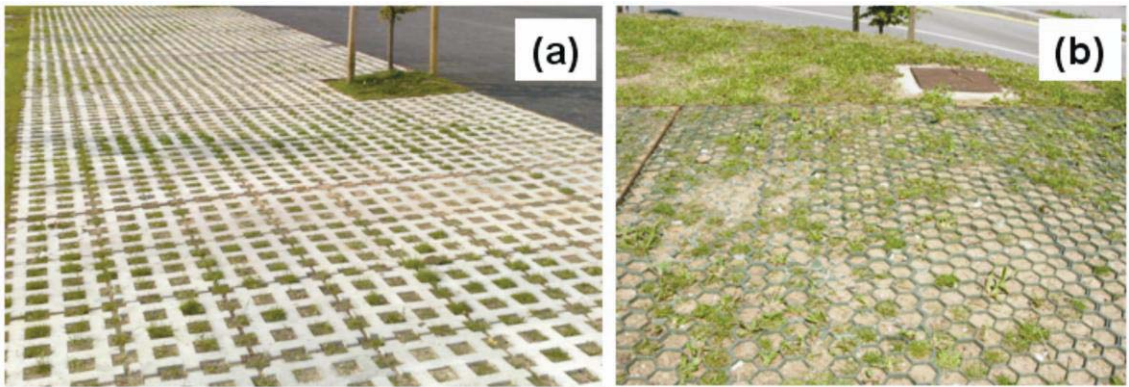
Permeable pavement types under study: (a) Reinforced grass with concrete grid and (b) reinforced grass with plastic grid
